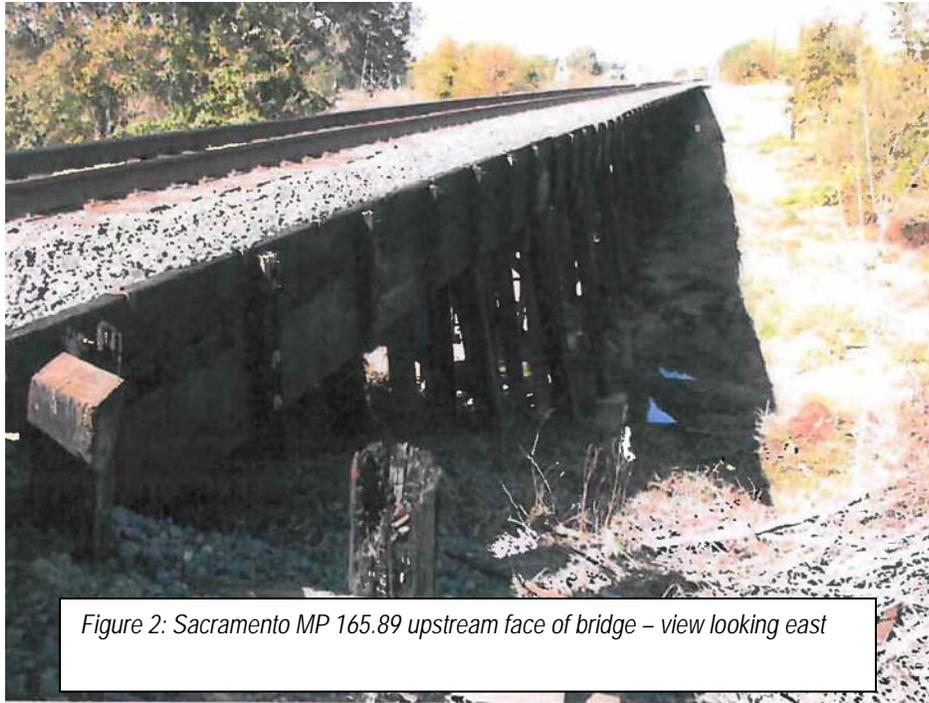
Sacramento MP 165.89 upstream face of bridge – view looking east
